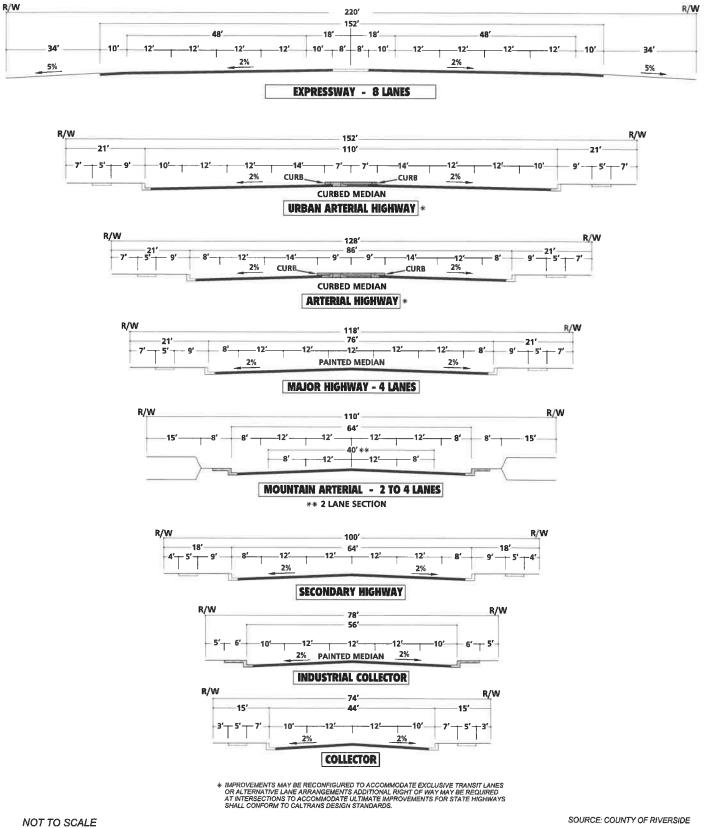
COUNTY OF RIVERSIDE GENERAL PLAN ROADWAY CROSS-SECTIONS
